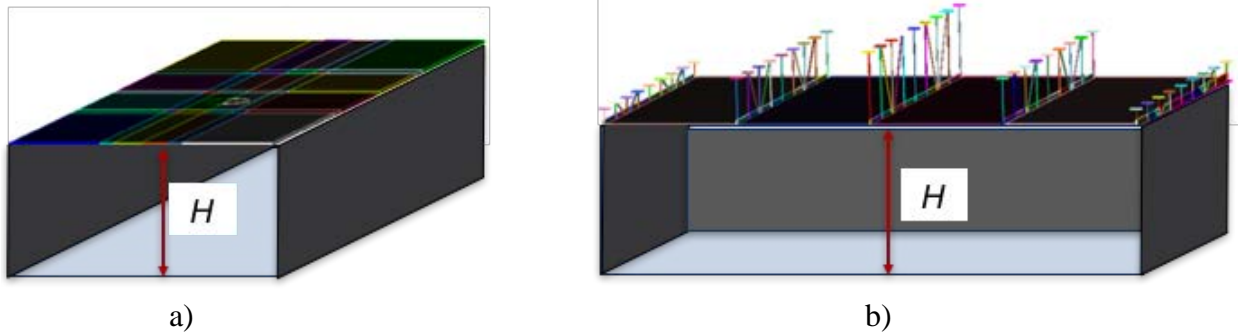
Tunnel structure configurations for a) CANA Tunnel and b) Ted Williams and Sumner Tunnels.
